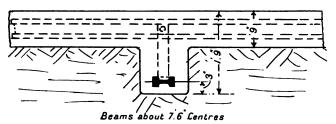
Foundation to Cartway. Part Longitudinal Section.
